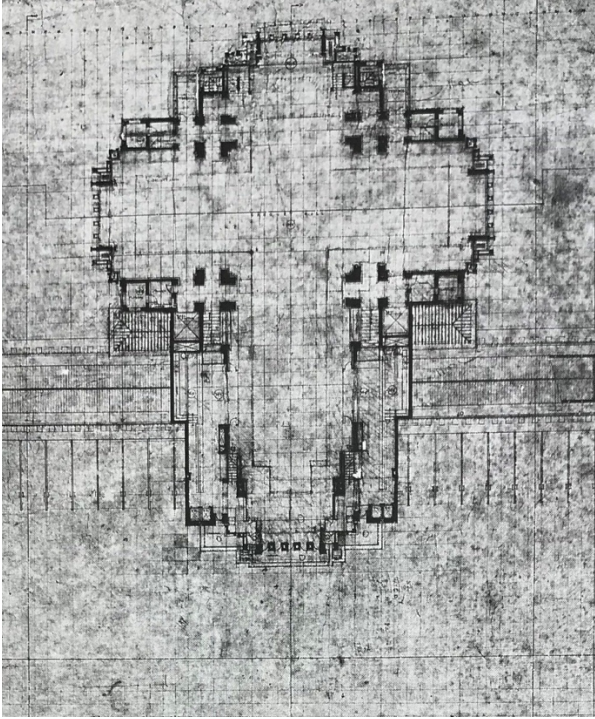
Frank Lloyd Wright, Imperial Hotel Banquet Hall floor plan.
